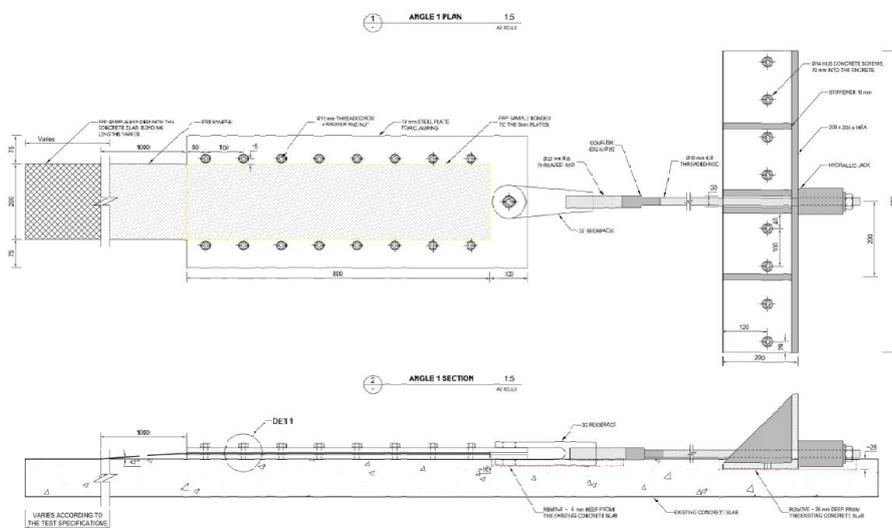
Experimental Setup. Plan view (top) and elevation (bottom)
